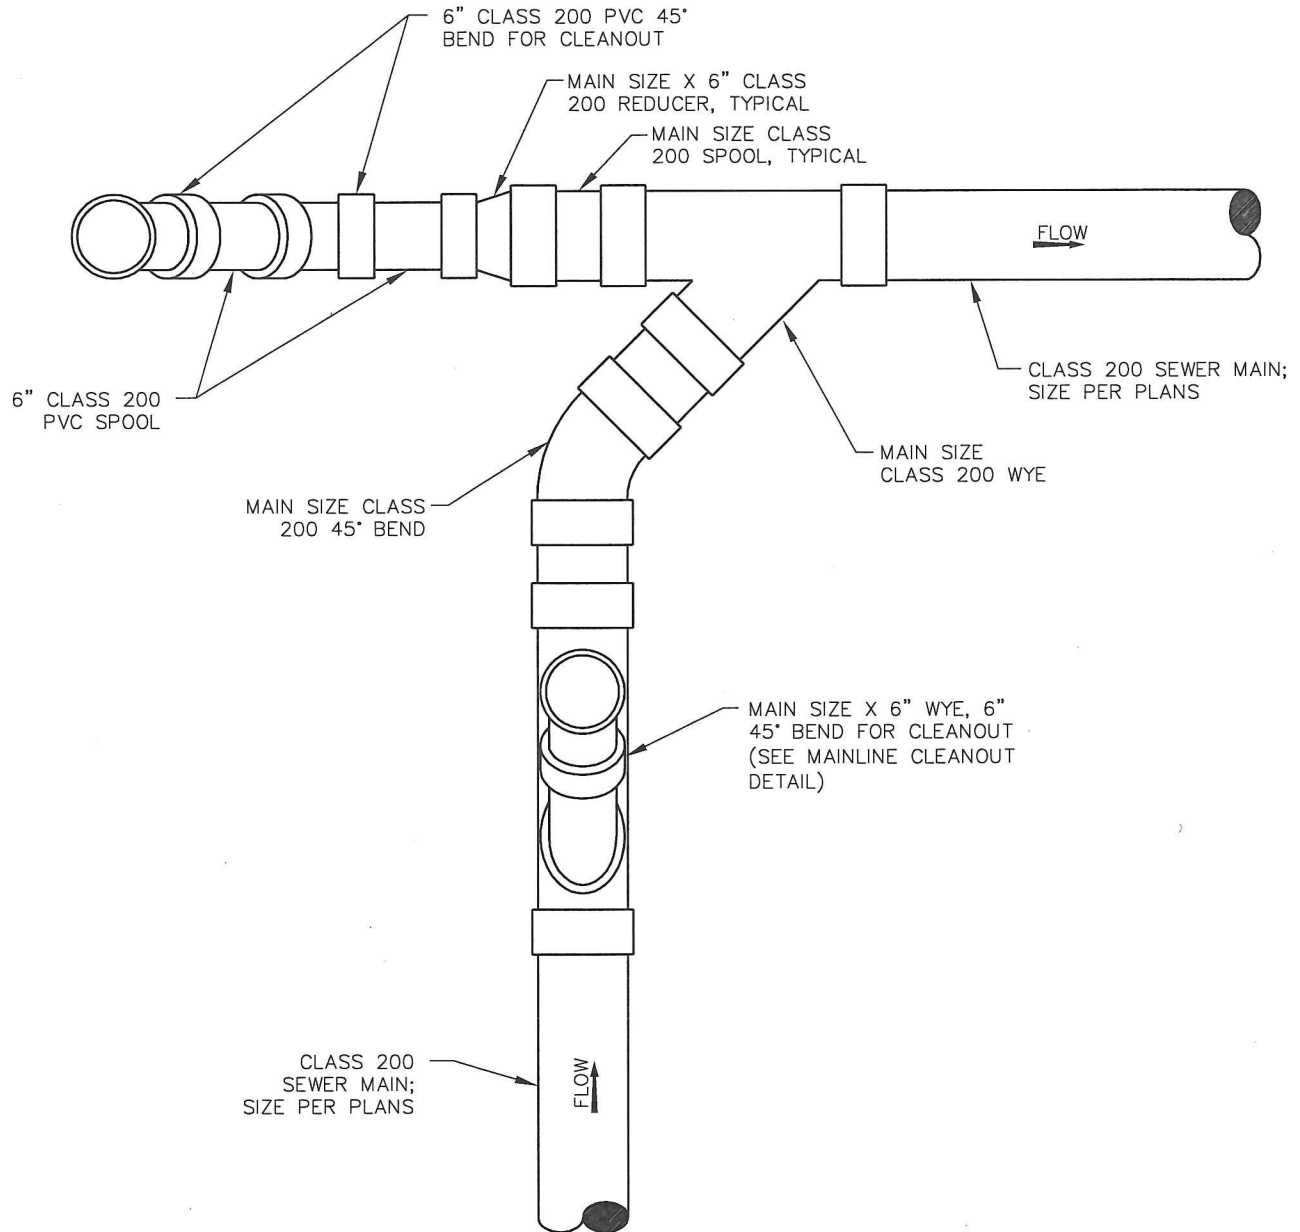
DETAIL NO.	NOT TO SCALE	SANITARY SEWER DETAIL
